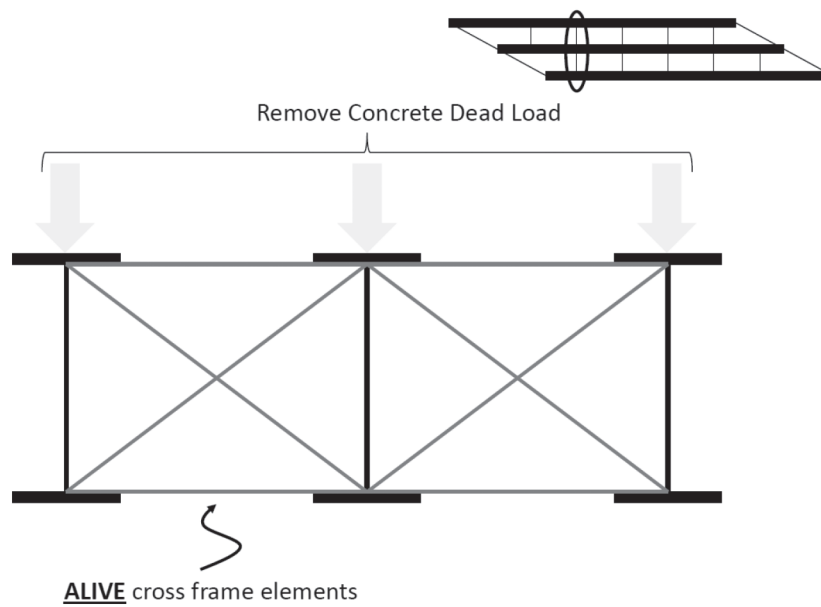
Removal of concrete dead load from girders after making cross-frame elements alive.
